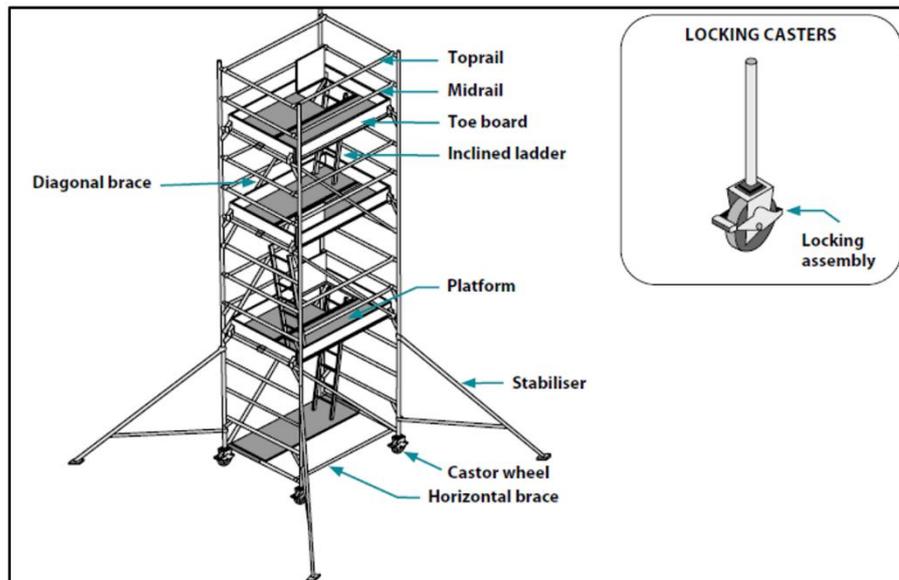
A mobile tower scaffold with inclined ladders, guardrails, braces, stabilisers and wheel locks provide for a safe working platform.
